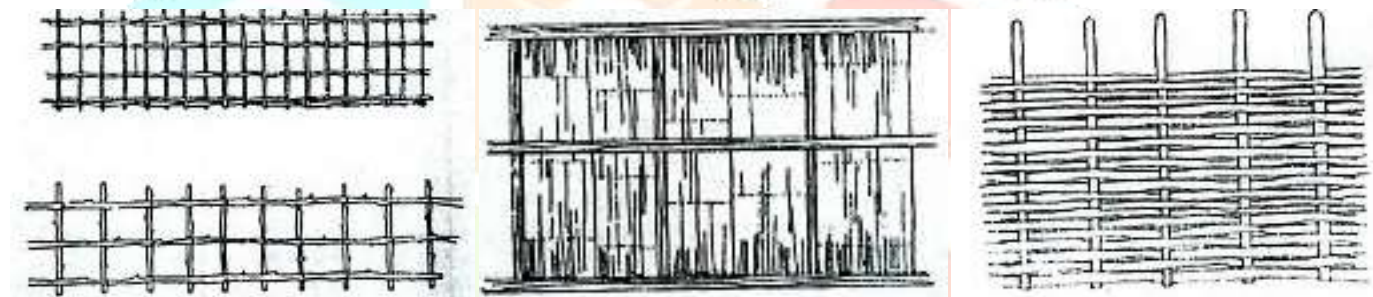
Bamboo boundary wall, bamboo mesh wall with mud plaster and bamboo mesh wall for poultry shed
